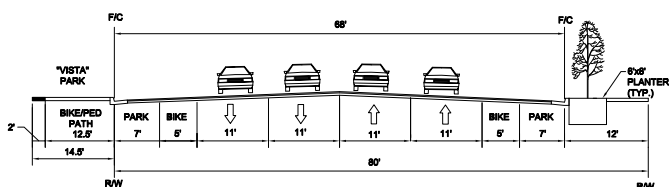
South Park Street Between Stanford Street and 5th Street (looking east)
